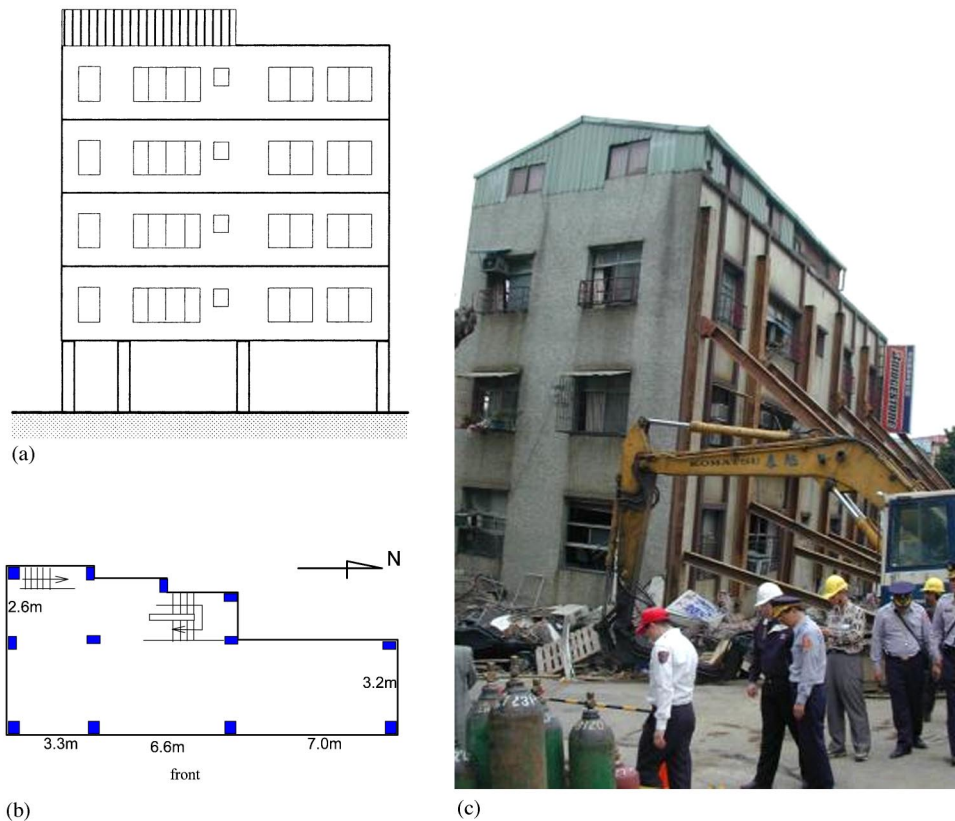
Schematic elevation (a) and plan (b) views of a 5-story apartment building. The 5-story building collapsed (c) in the 31 March earthquake due to a soft first story and poor configuration of the structural system.
